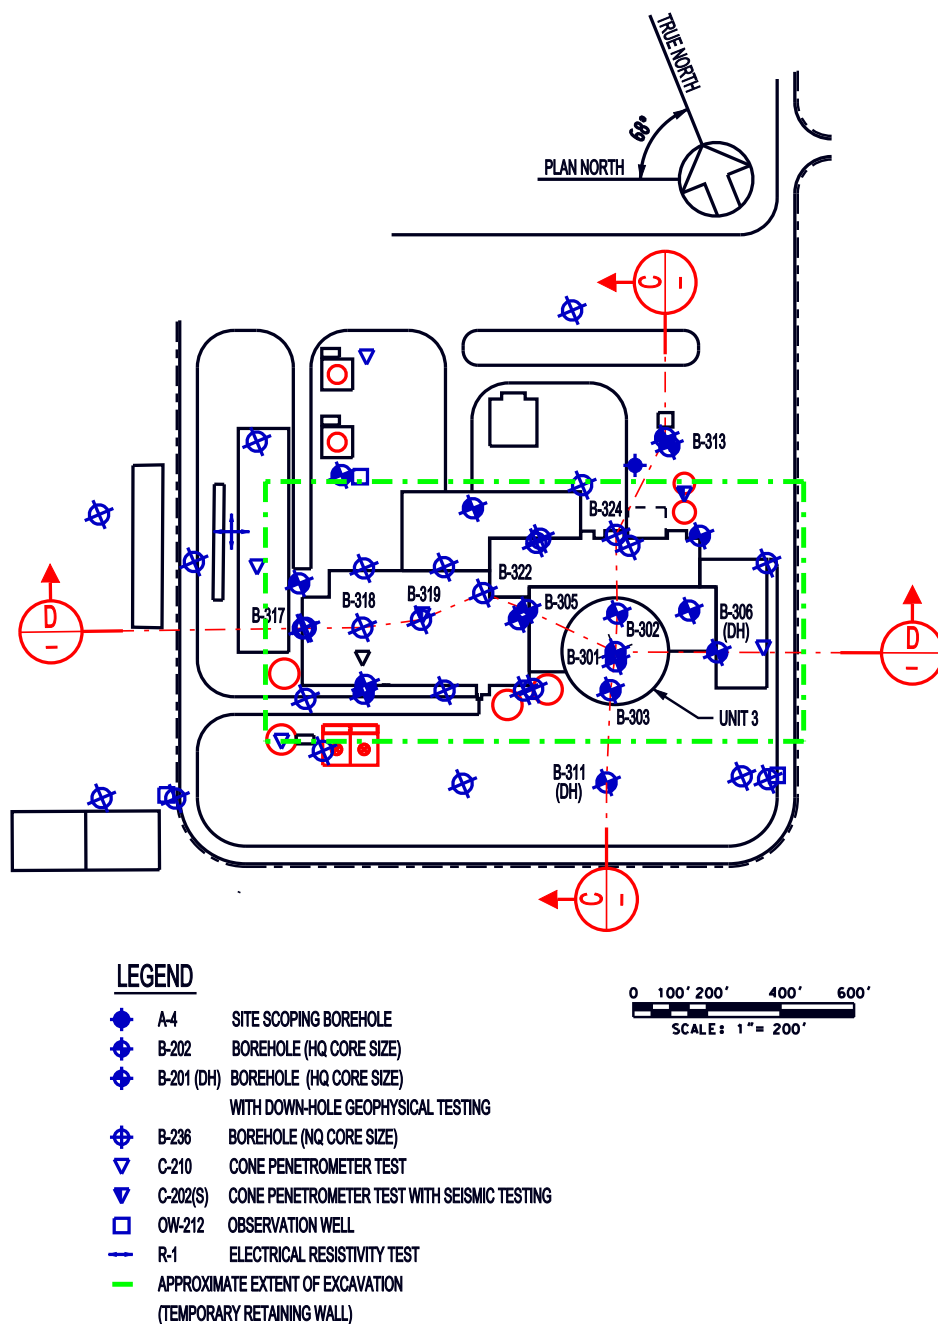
Profile Location Map Showing Excavation Geometry, Unit 3 (Sheet 2 of 2)
